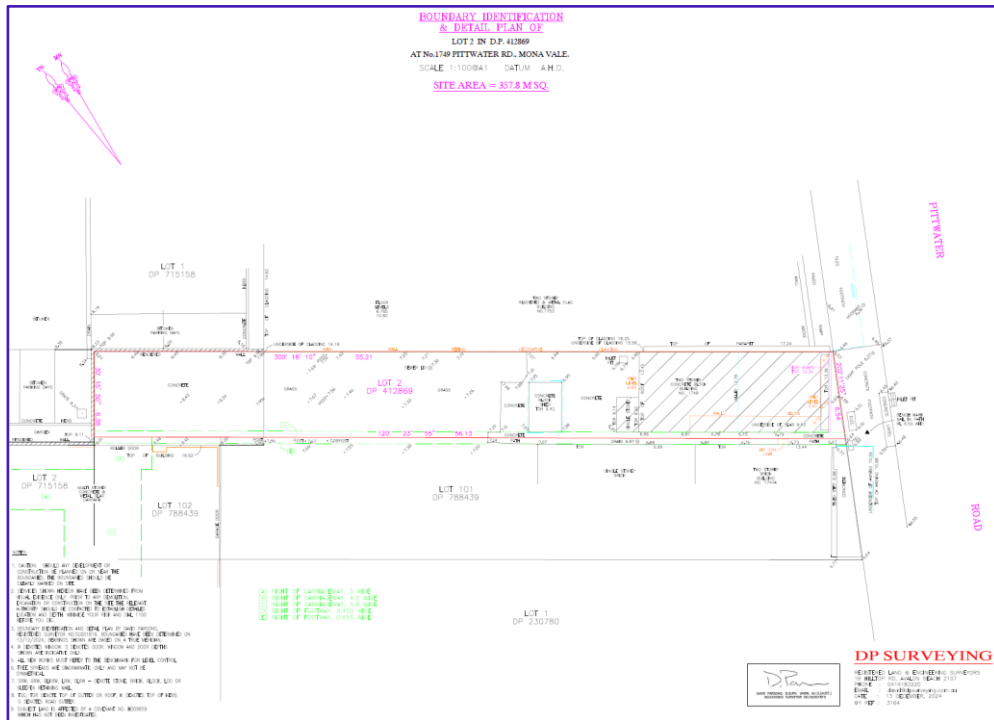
Site survey – 1749 Pittwater Road, Mona Vale
